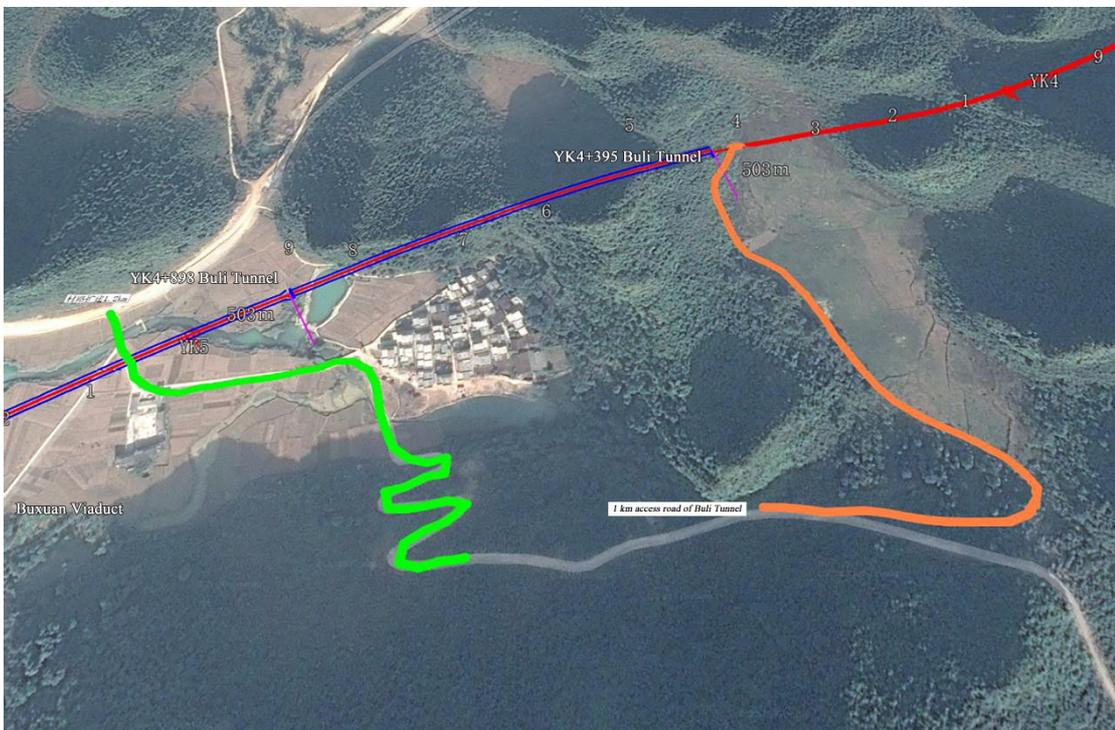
Location of New Access Road to Entrance of Buli Tunnel
